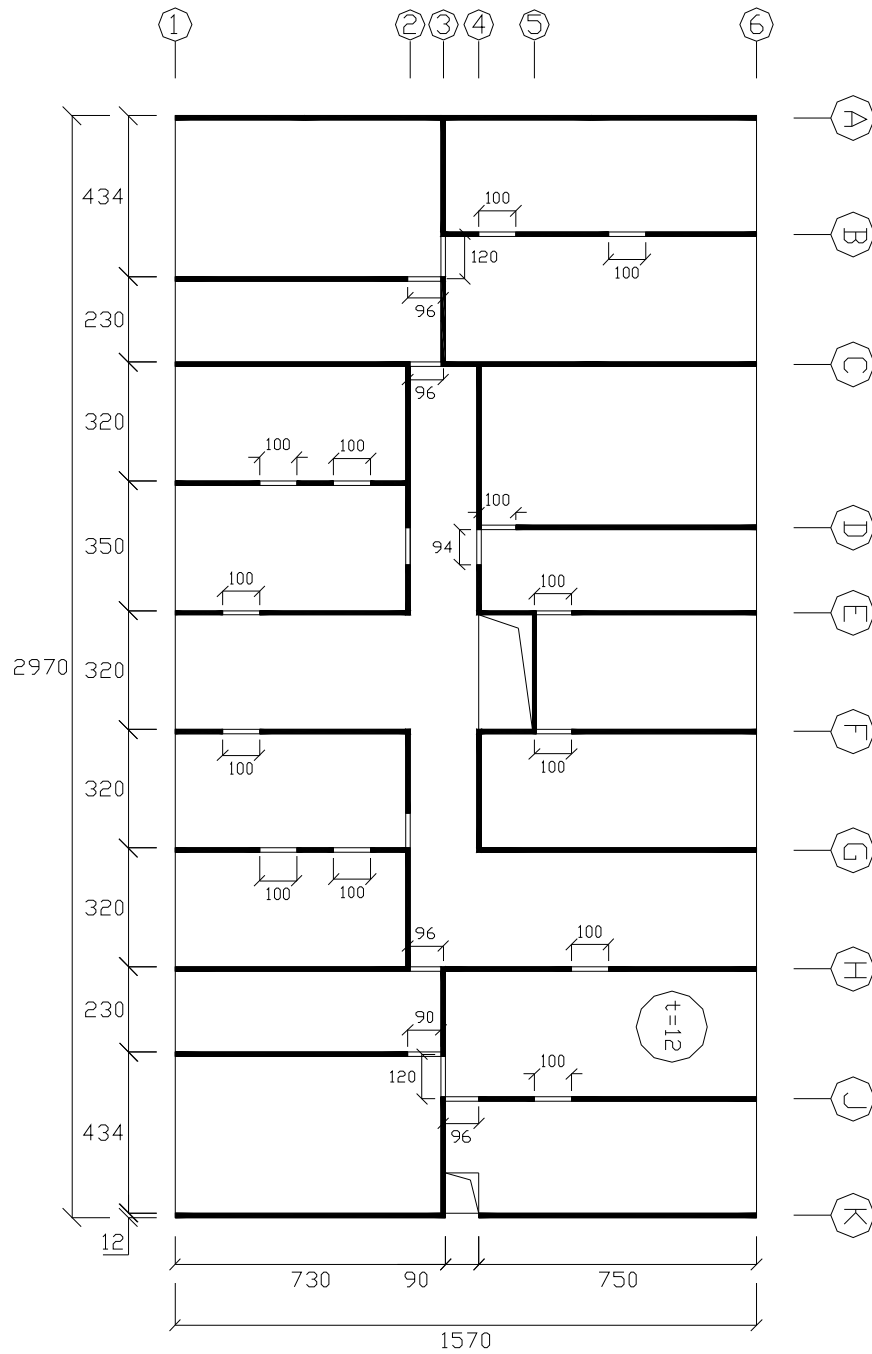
Typical plan view – Plan No. 1 (units in cm)
